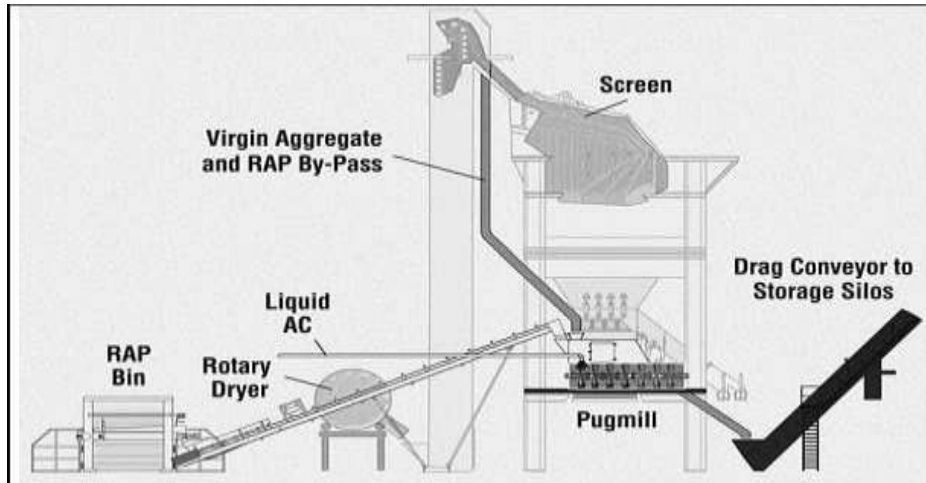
Batch plant with pugmill mixer, (Santucci, 2007).
